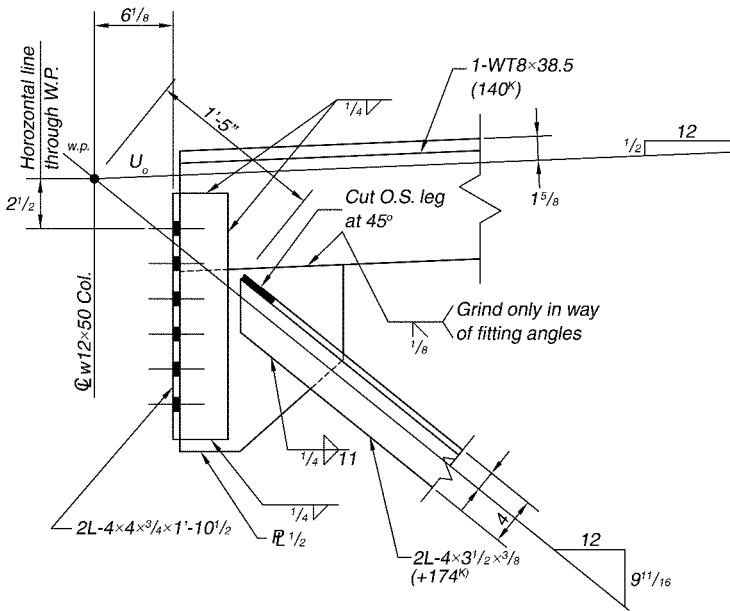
Truss-support connection, working point (w.p.) at column centerline.
